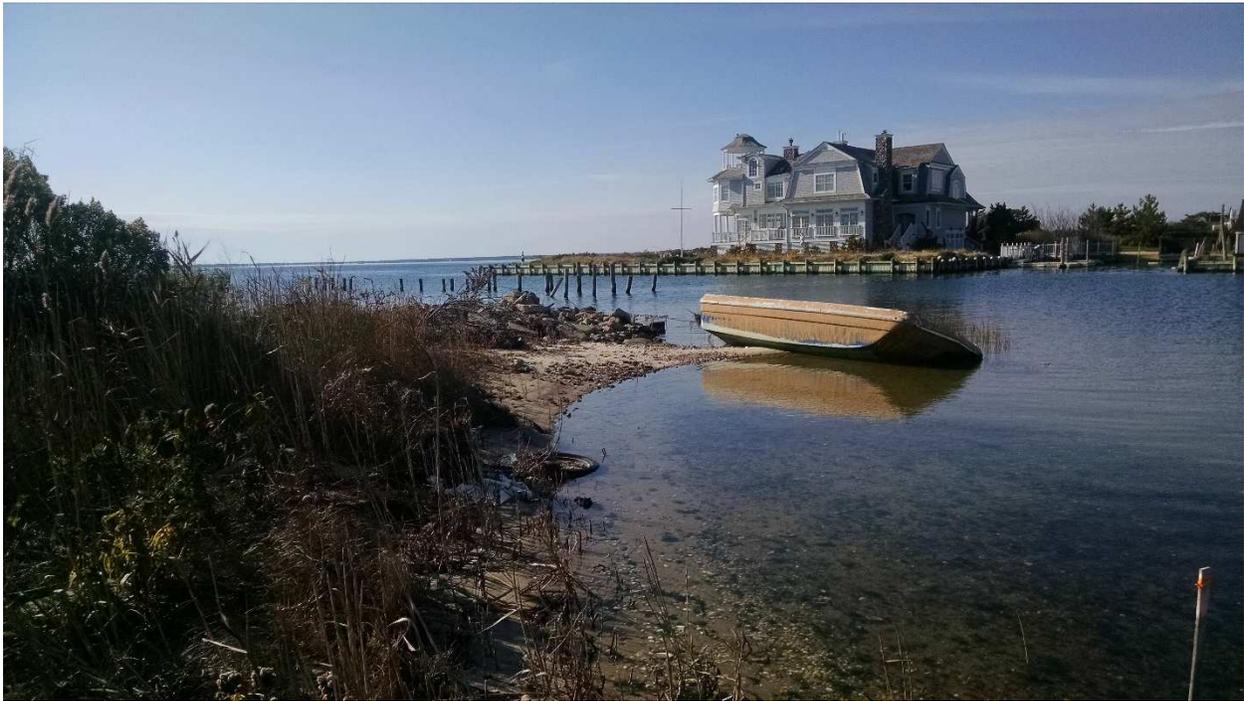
Facing West: toward the area where the mean high wave break wall is proposed to be built.
